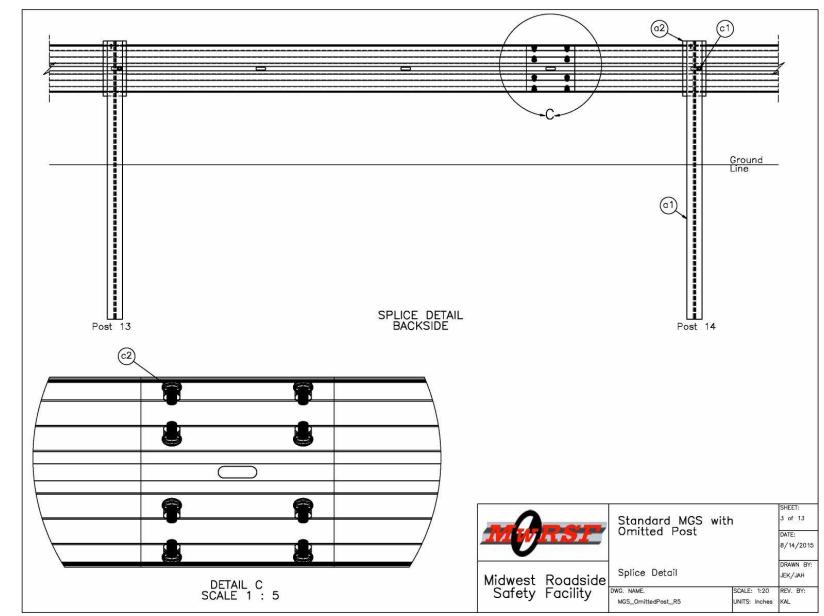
End Section and Splice Detail, Test No. MGSMP-1
